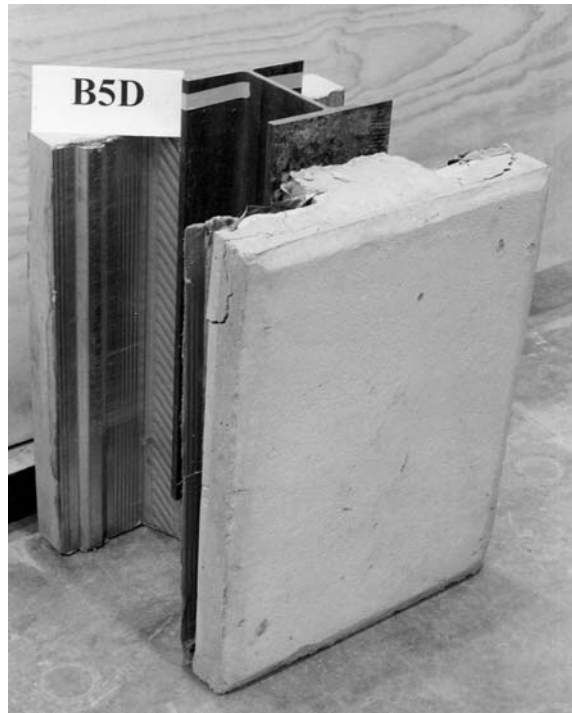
Detached Slab of Failed Specimen with Deck Slabs.
